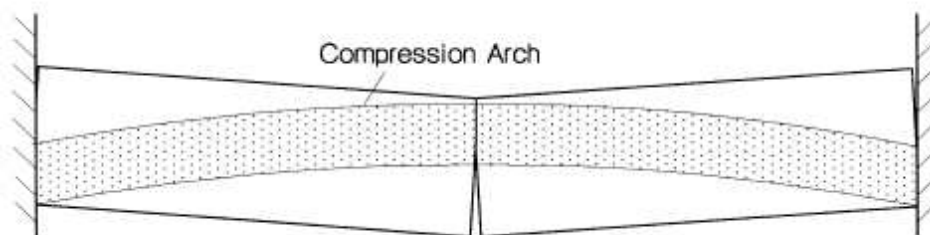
Conceptual diagram showing a compression arch in roof bedding planes.
